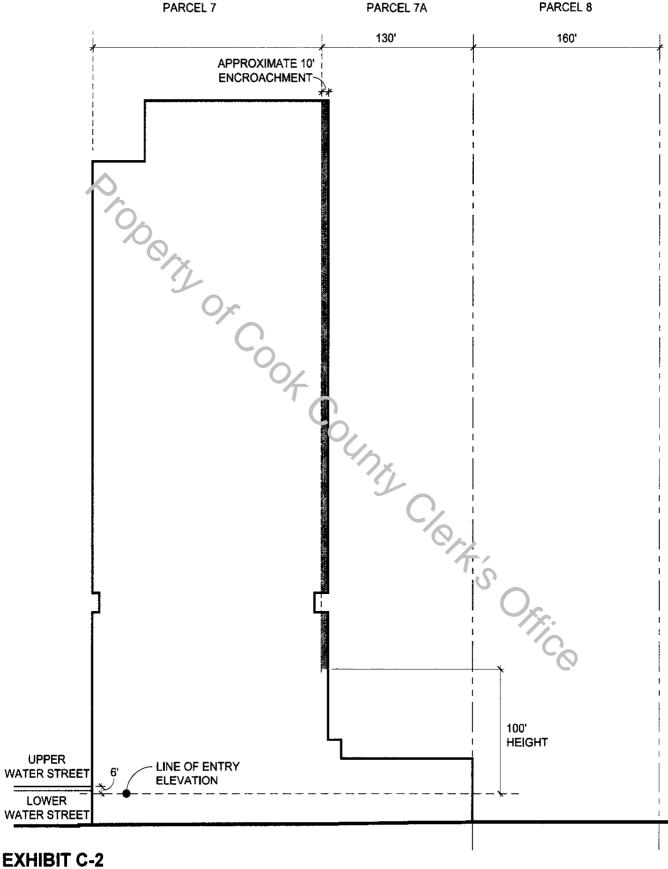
EAST ELEVATION DIAGRAM OF PROPOSED ENCROACHMENT AUTHORIZED ABOVE 100'
